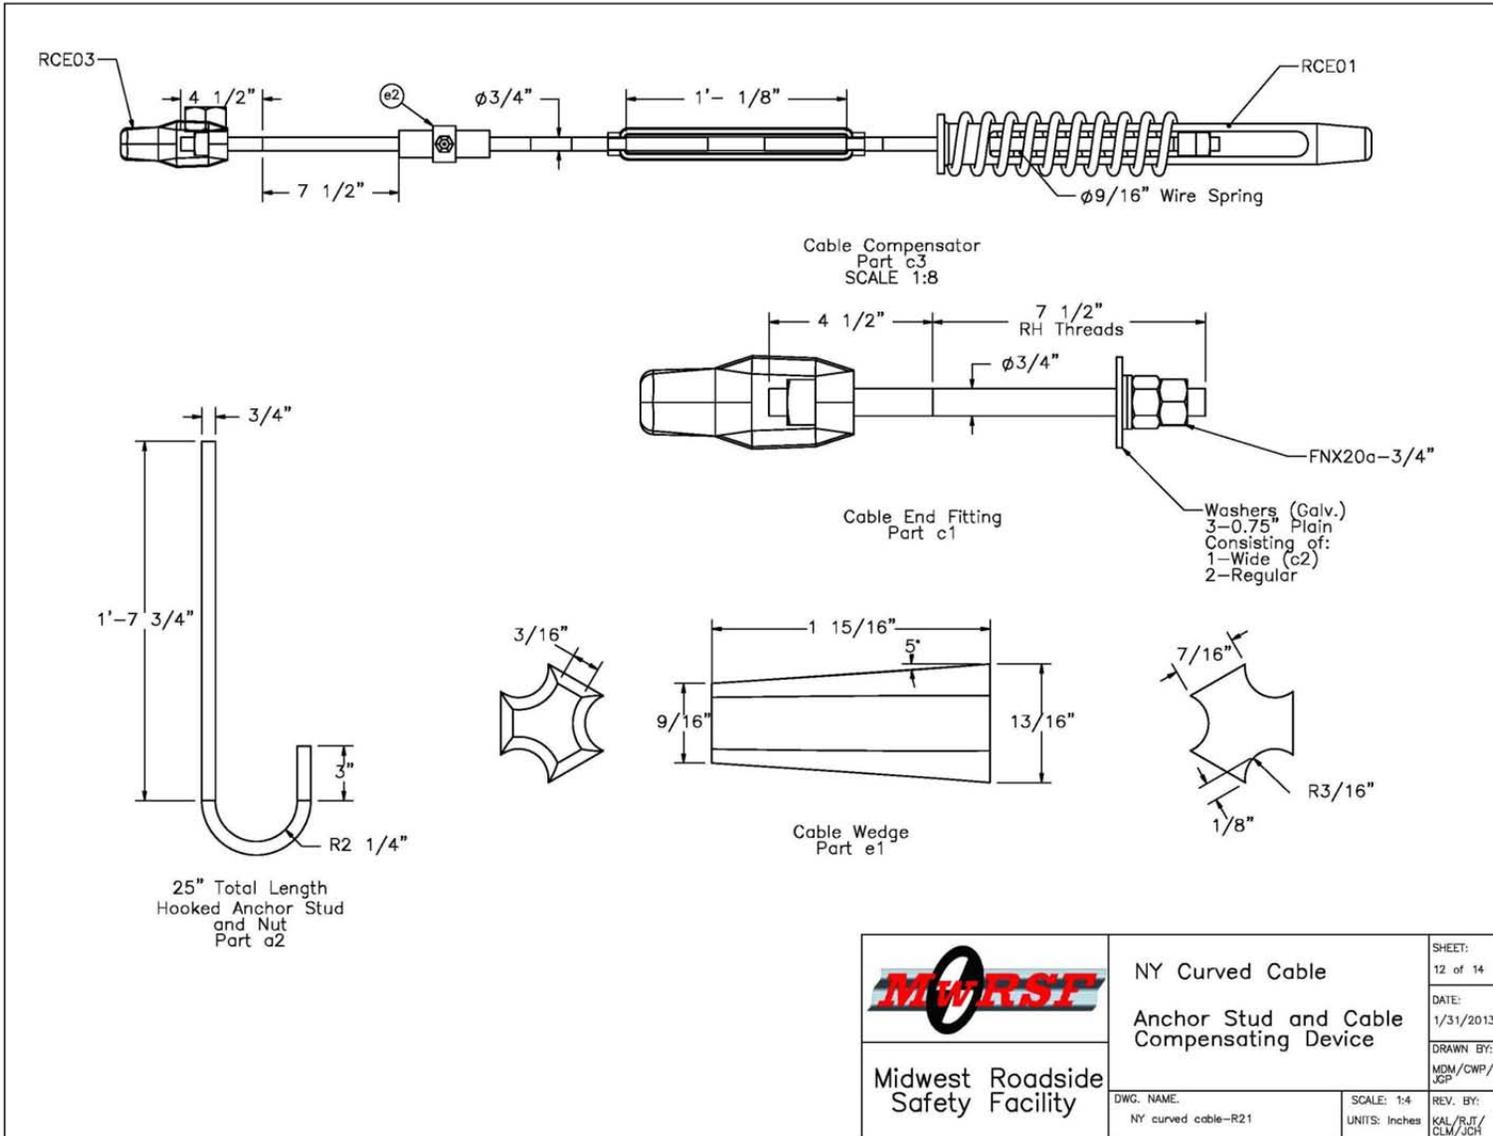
Cable Compensator Component Details, Test No. NYCC-1
